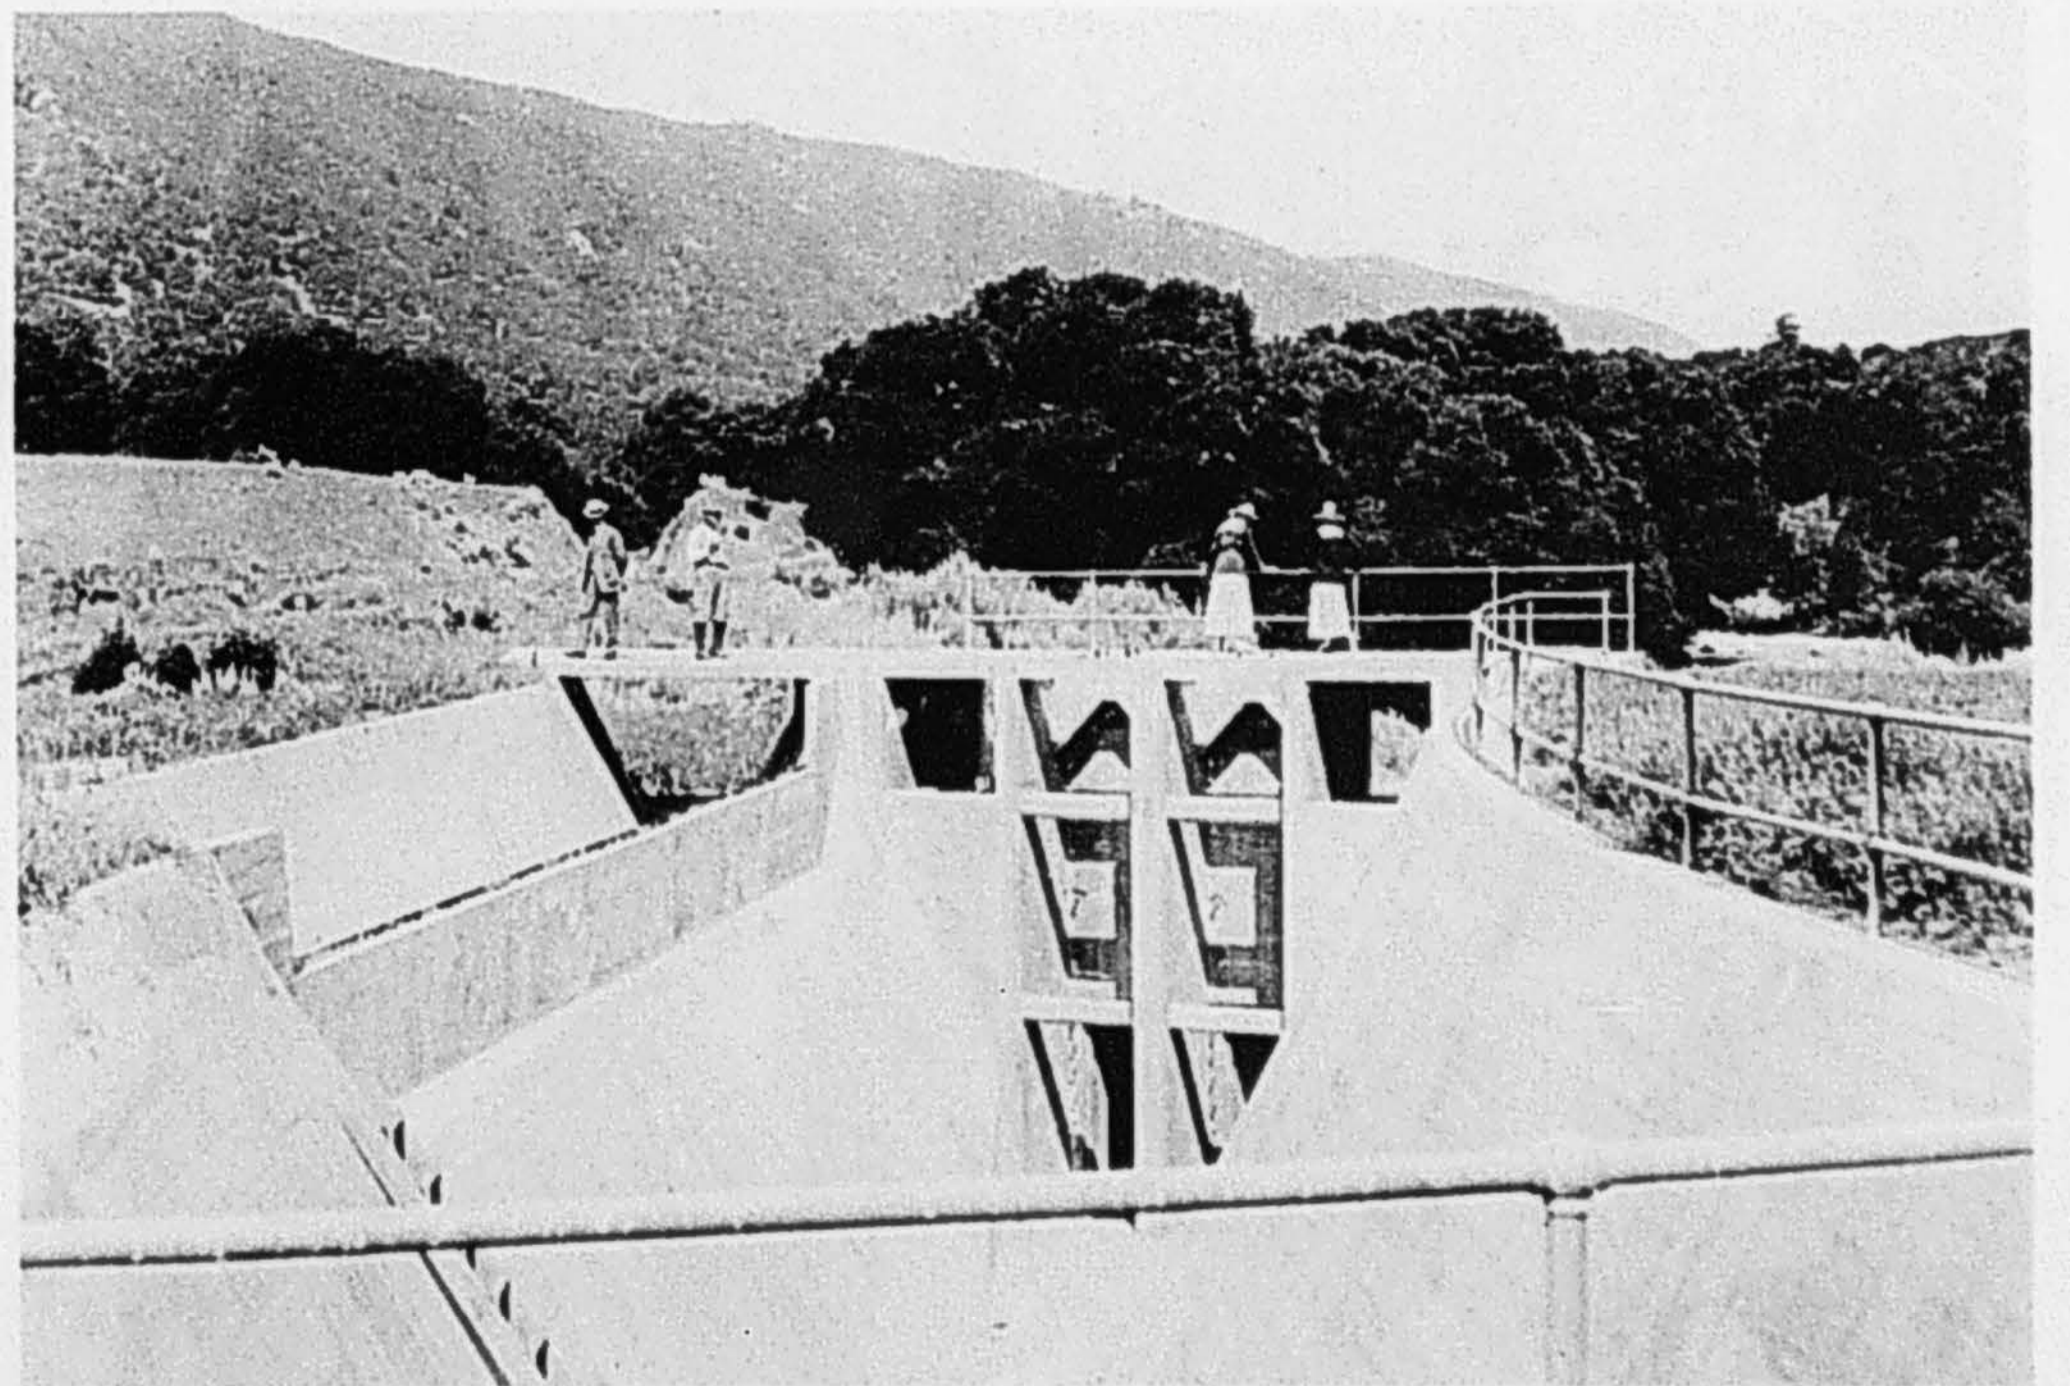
Settling Basin at Lower End of Outlet Tunnel, Warner Dam Site.
